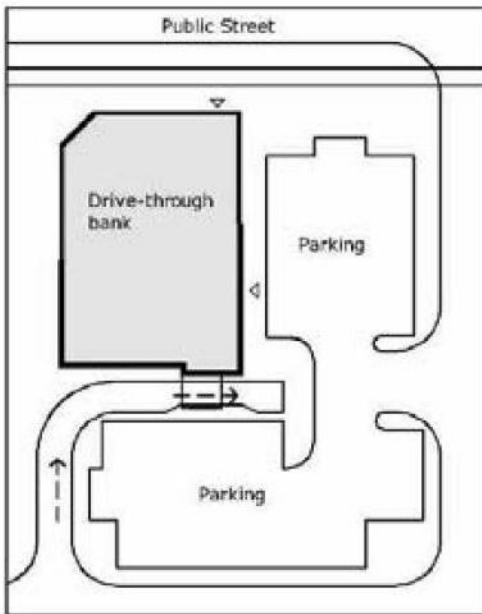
Drive-through is located clearly internal to the site and not visible from the abutting public street right-of-way.
